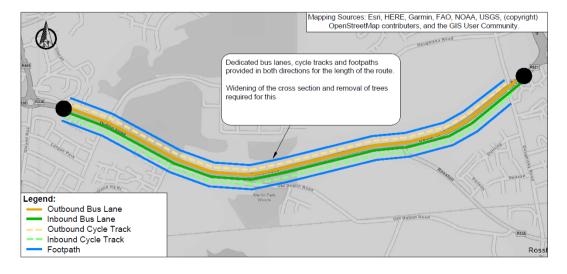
Section 2 Option 1 Indicative Scheme Design
